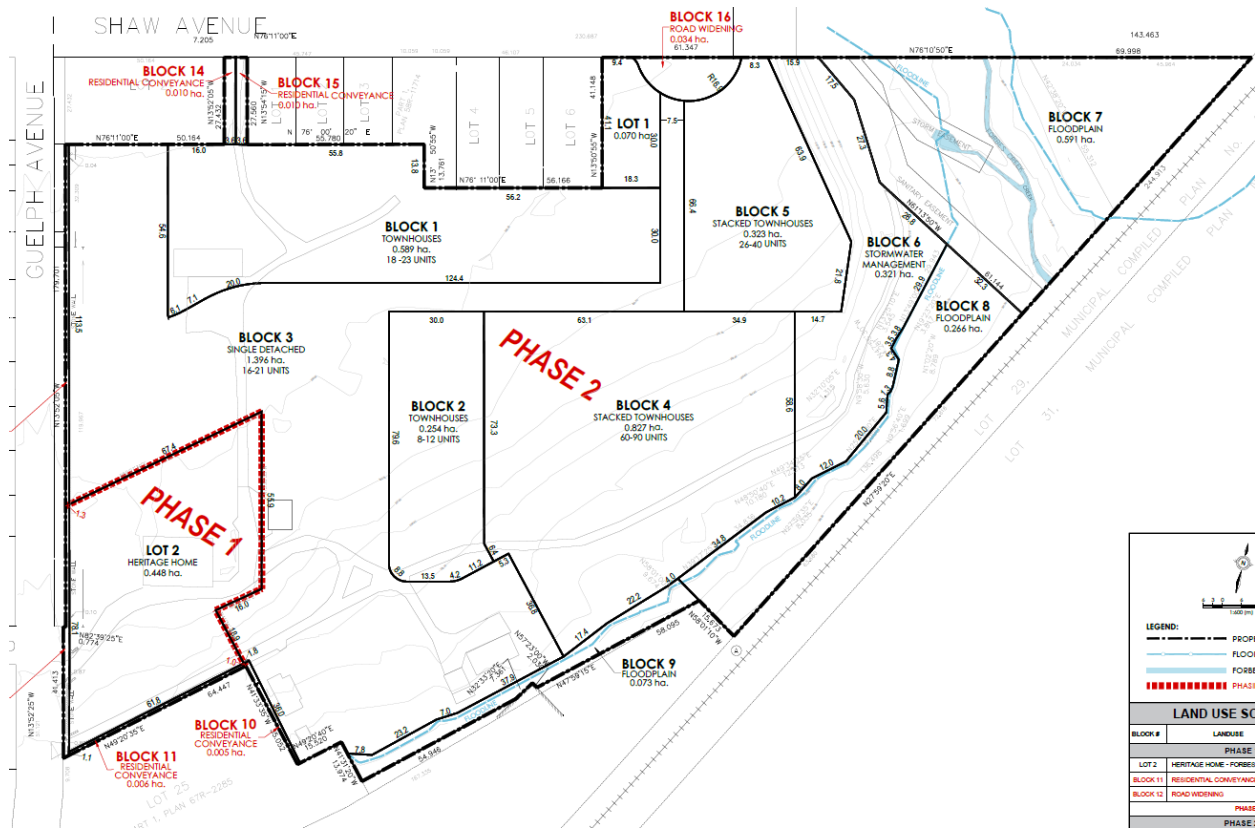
Map of approved Plan of Subdivision for 171 Guelph Avenue (Polocorp Inc.).
